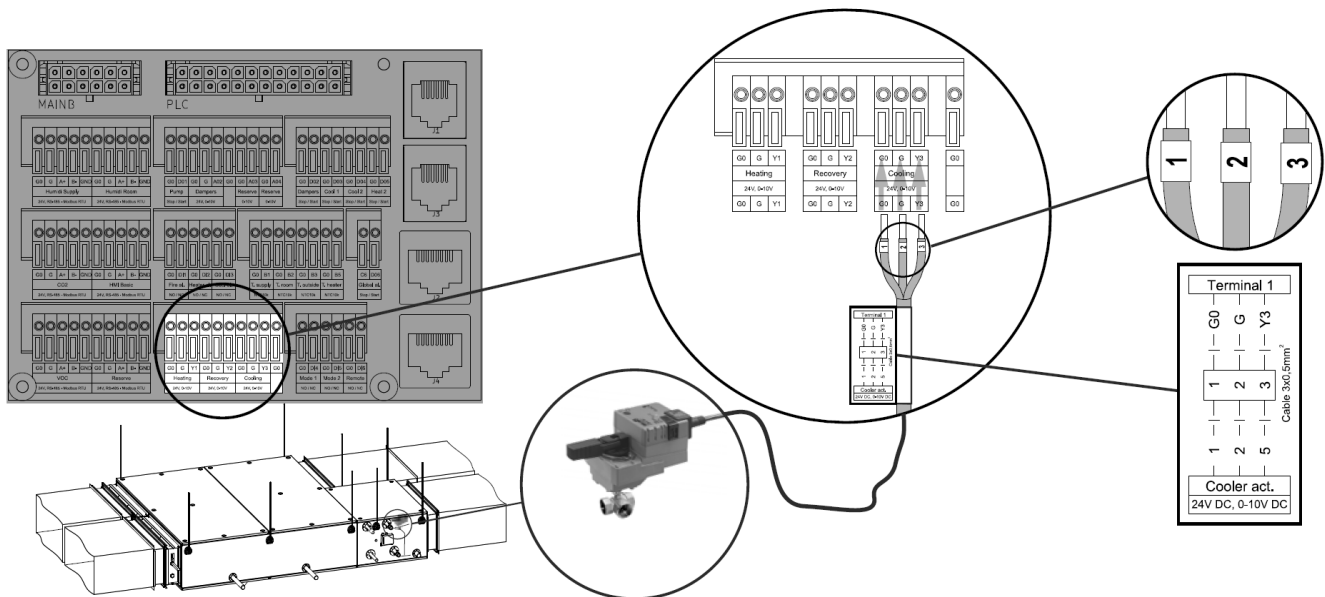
Connection of the water cooler 3-way valve. Port Cooling
